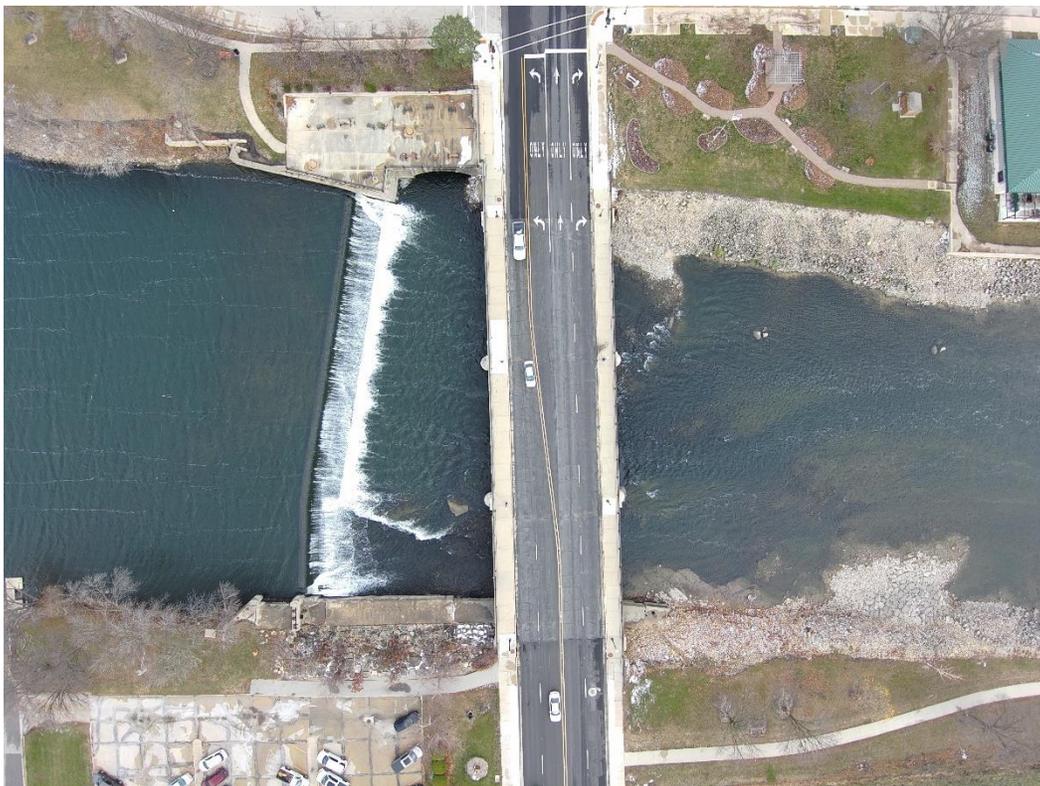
BRIDGE PLAN VIEW TOP NORTH
